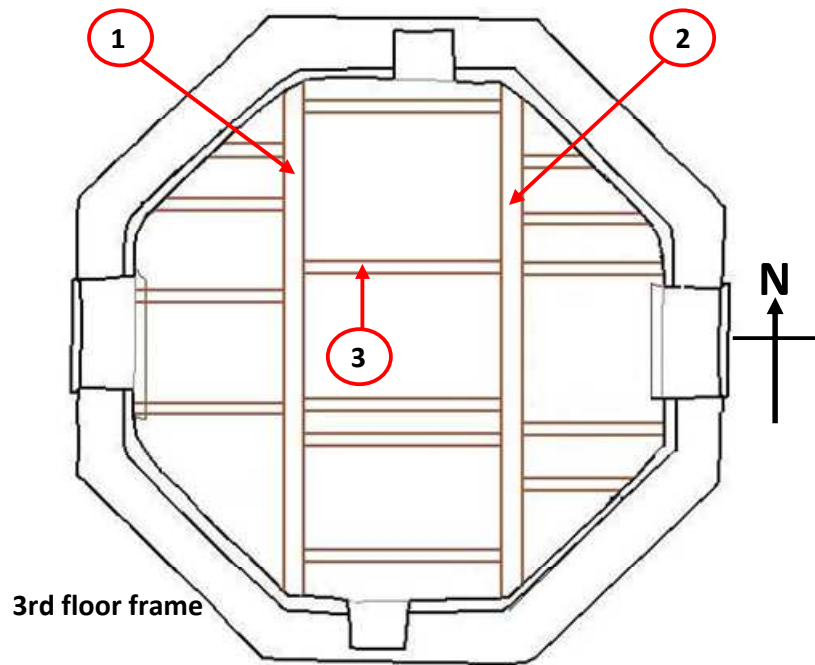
Plan to help locate sampled timbers (after FAS Heritage)
